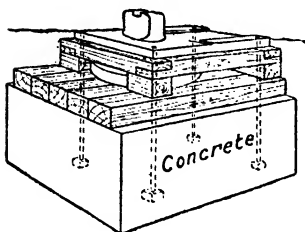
Typical Foundation for Steam-Hammers of the Overhanging Form.
